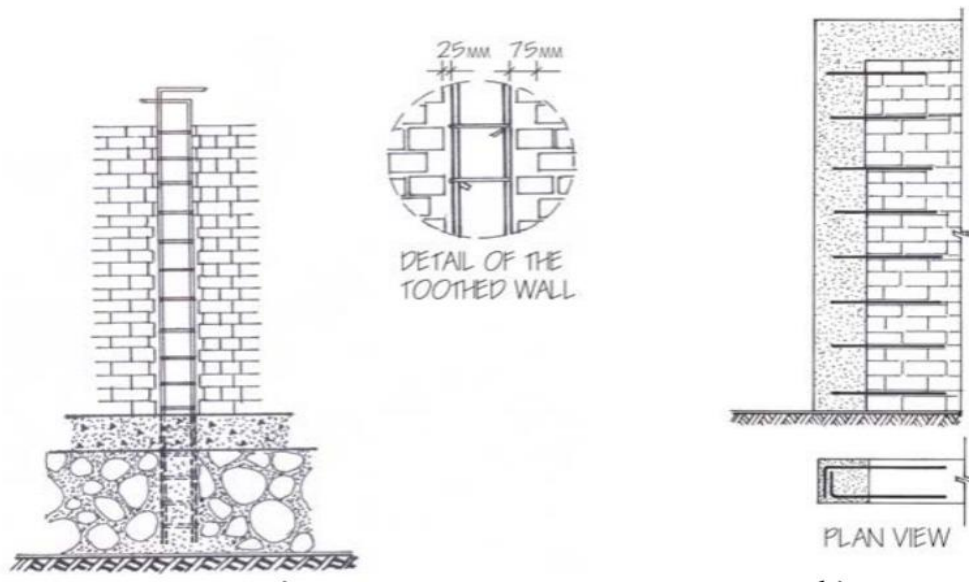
Toothed wall construction (left) & horizontal dowels bar at the wall-to-column interface (right).
